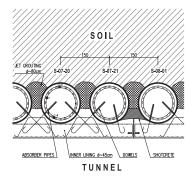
Detail to Fig. 20: Longitudinal section through the energy tunnel wall. The primary lining consists of bore piles with jet-grouted columns in between and is connected to the watertight secondary lining by dowels. Every third pile is equipped with absorber pipes that are situated behind reinforcement bars and thus protected from damage through dowel installation for the inner lining (reinforced concrete panels). Also shown is the location of measurement instruments in pile 5-07 – 20.
